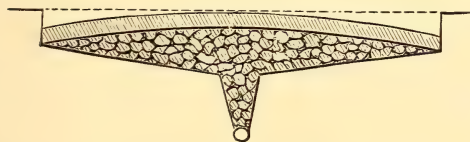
Cross-section of Garden Walk, not intended for heavy wheeled traffic. In heavy soils two side drains should be substituted for the central drain.
